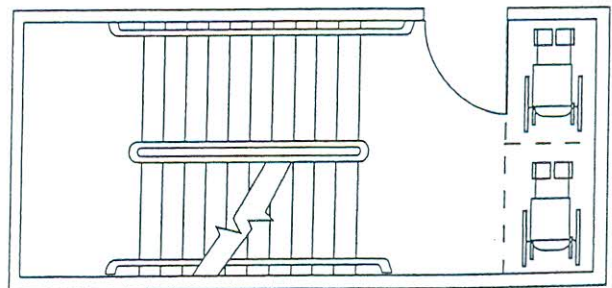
Exit Stair Used as an Area of Refuge
